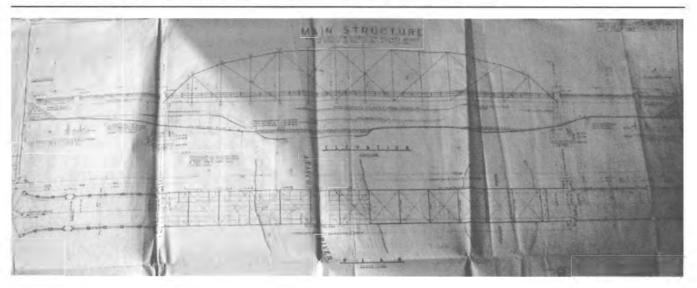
Elevation and plan of the Main Structure One Through Pin Connected Highway Bridge, Federal Aid Project 3 A (1) Insular Road, Mayagüez-Rincón, Fiscal Year 1940. AGPR, Obras Públicas, Carreteras y Puente, Caja 2860.
